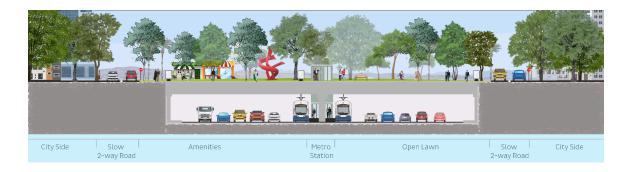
| Cross Section of a cap park over a 10-lane freeway with light rail tracks and station (Inspired by Space 134)
